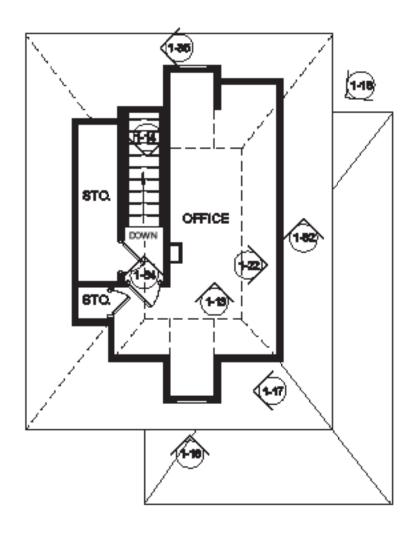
Second Floor Plan, 2020 (source: Ratio)
